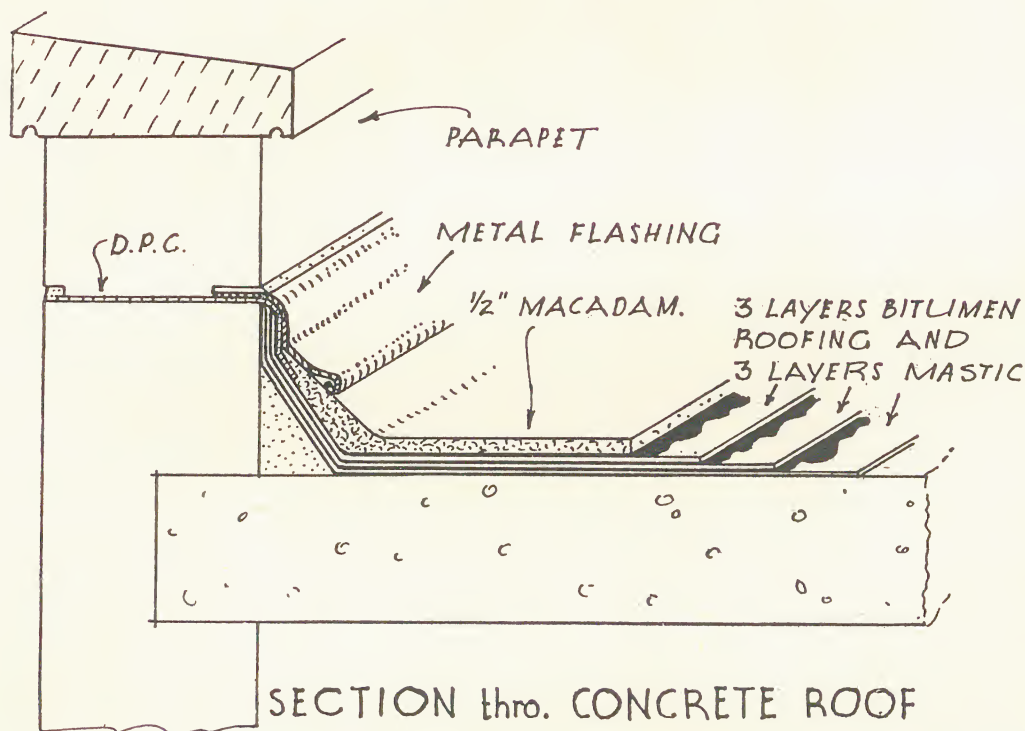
“Macasfelt” roofing on concrete flat roof.
